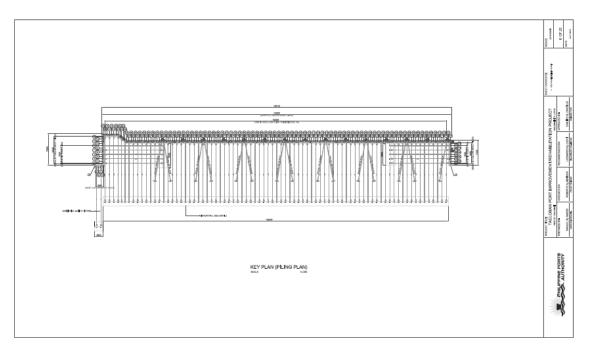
Key Plan of Steel Pipe Sheet Pile with Anchor Wall and Tie Rod
